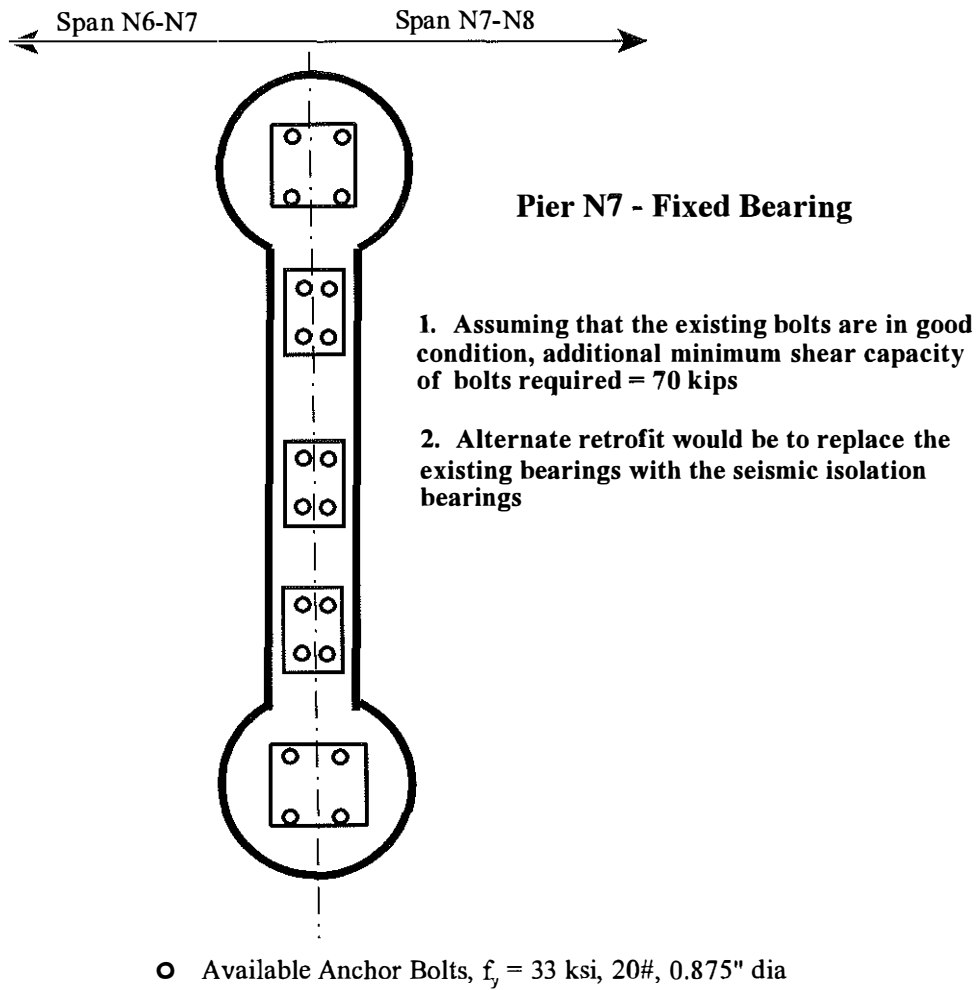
Minimum Required Shear Capacity ( $V_{req}$ ) to be Provided by Additional Anchor Bolts at Bearings of the Pier N7 on the Evansville, IN Approach on the US41 Southbound Bridge
